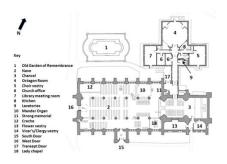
Ground plan of St Peter's church with key to principal areas and facilities
